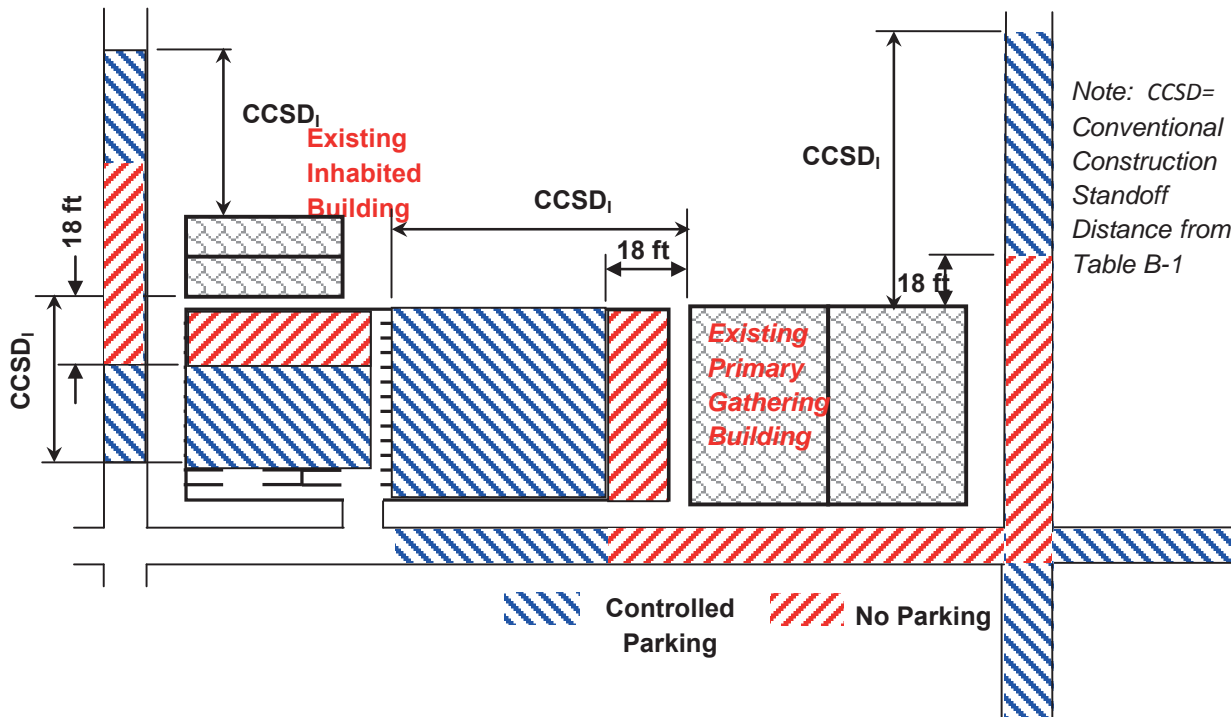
Parking and Roadway Control for Existing Buildings – No Controlled Perimeter
